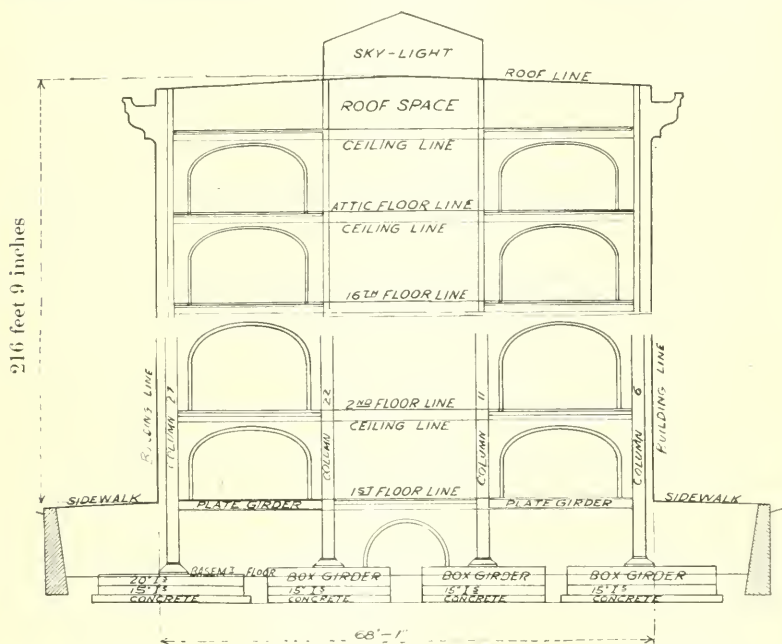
PORTAL BRACING, OLD COLONY BUILDING, CHICAGO.
